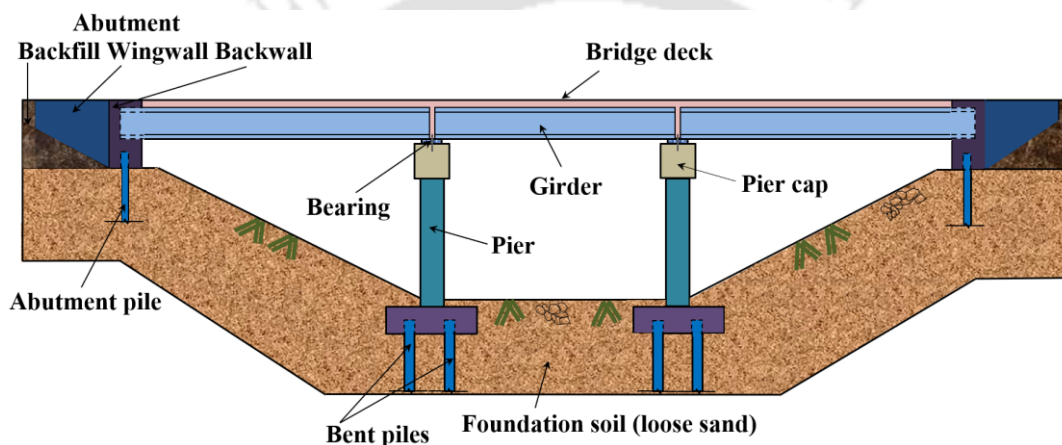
Typical configuration (elevation in the bridge longitudinal direction) of the multispan continuous integral abutment bridge adopted in the study.
